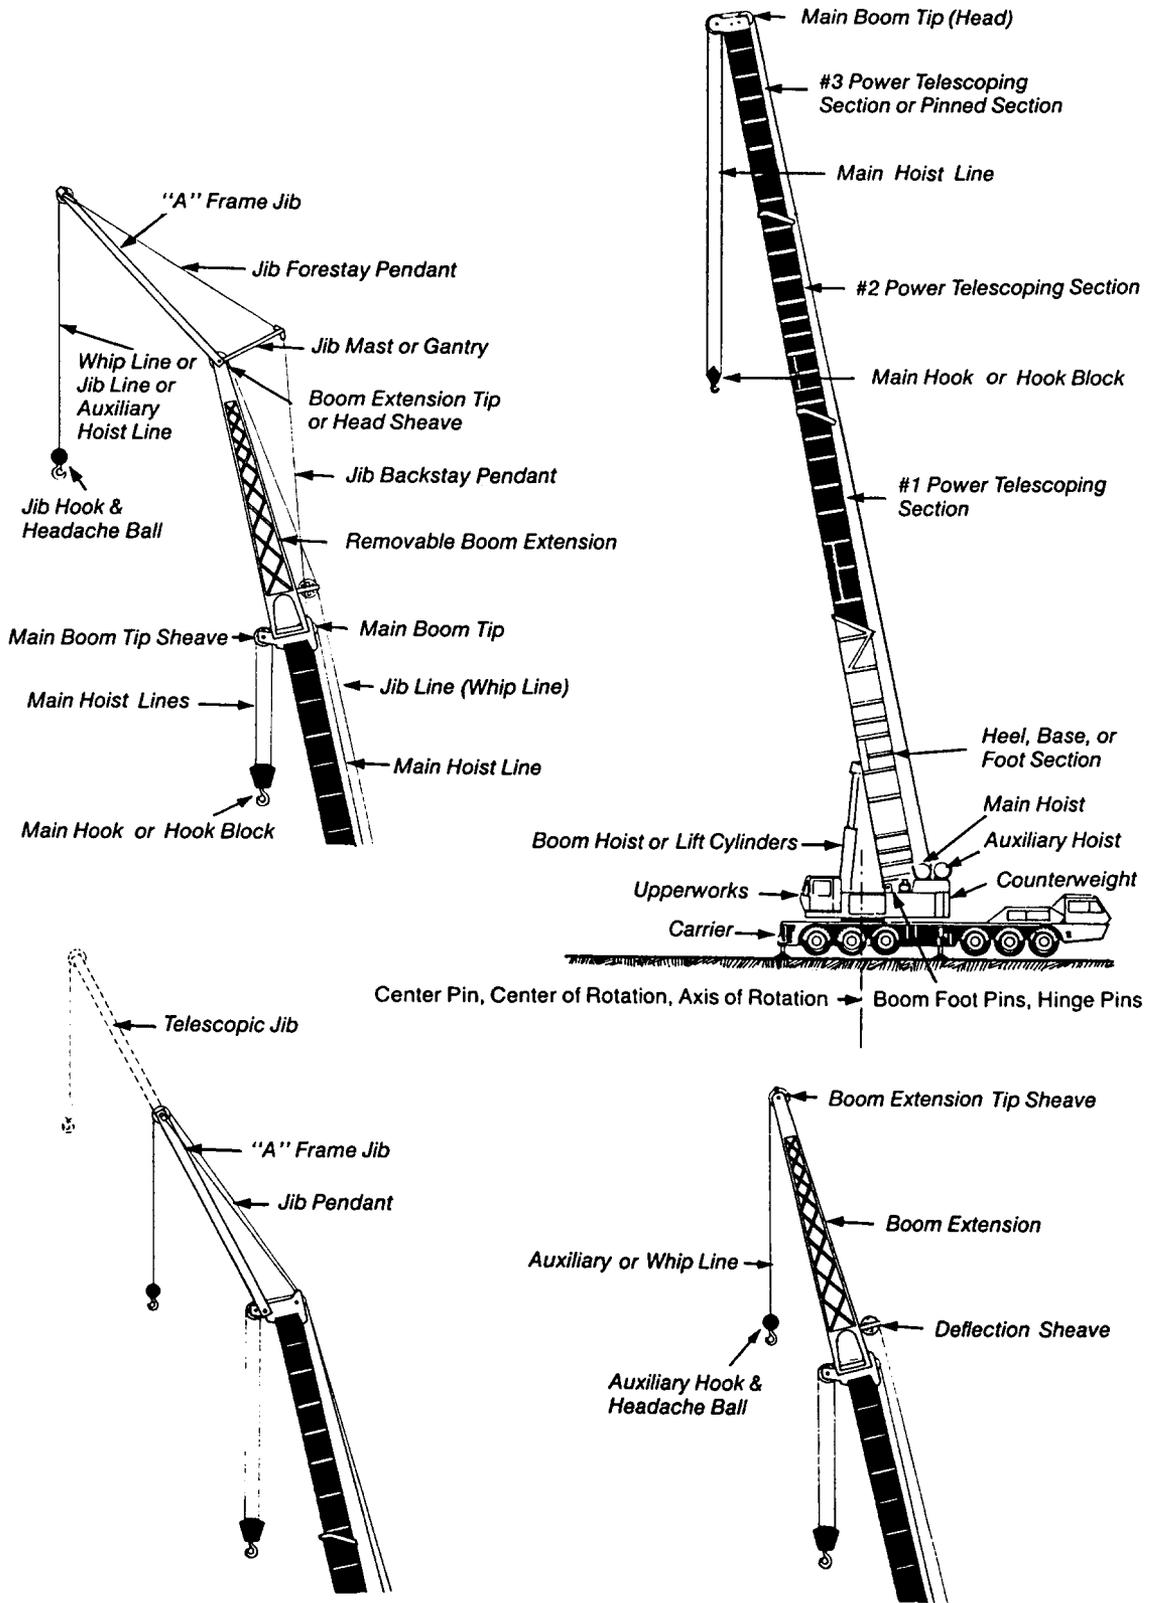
Carrier-Mounted Telescopic Boom Cranes¹
